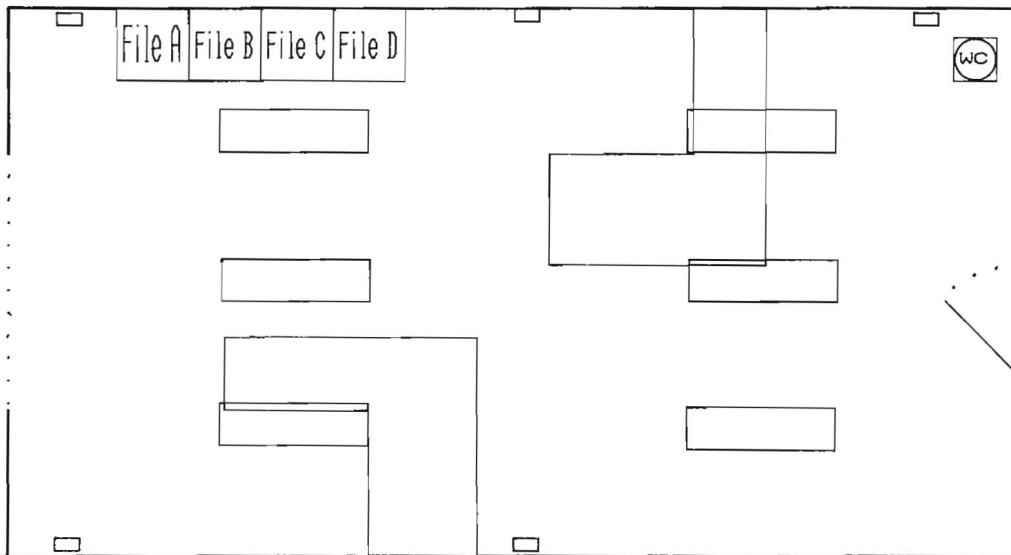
The Finished Drawing. Once a drawing is complete it may be printed or plotted on paper. Printing the drawing will produce the current view of the window. Sending the drawing to a plotter will produce the drawing regardless of the view (zoomed, etc.). Portions of a drawing can be plotted by use of the Format command. If the grid lines are turned on they will be printed or plotted with the drawing.
